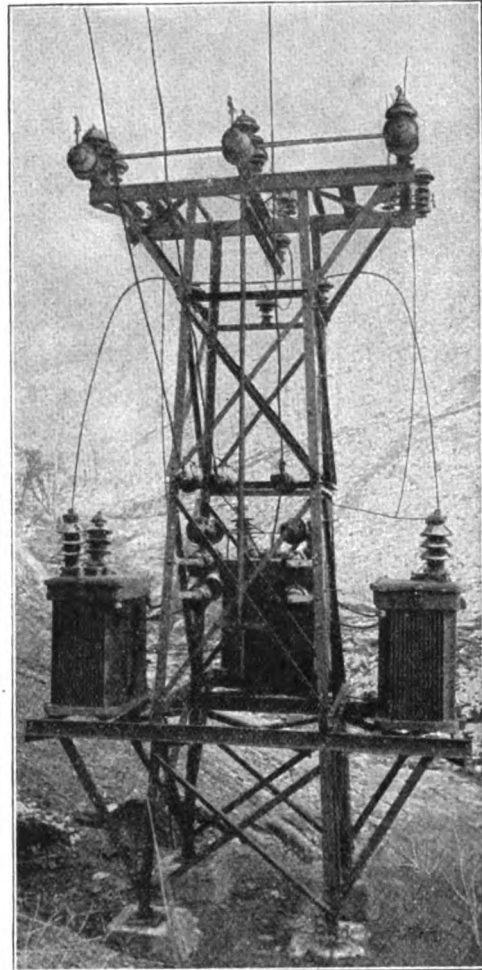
TYPICAL MODEL P OUTDOOR SUBSTATION
